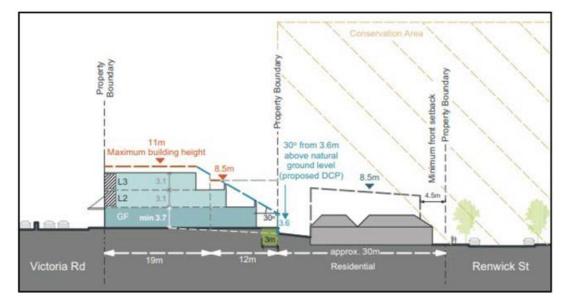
Proposed maximum building heights on the western side of Victoria Road (source: planning proposal)
